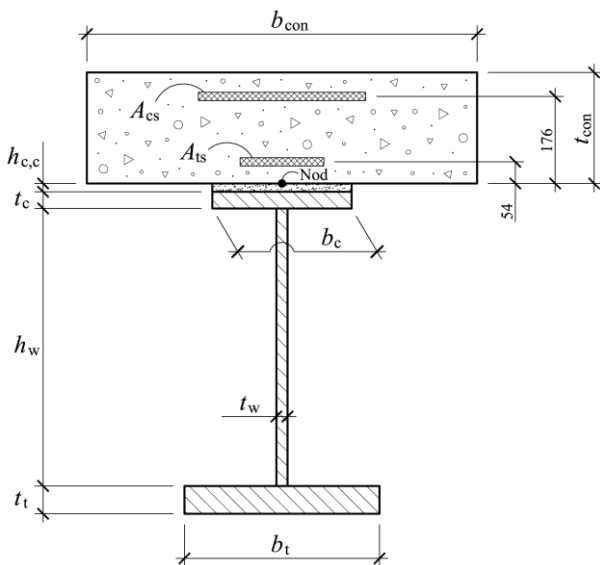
Schematic drawing of a cross section belonging to one of the two parallel beams. The specified dimensions are given in mm.
